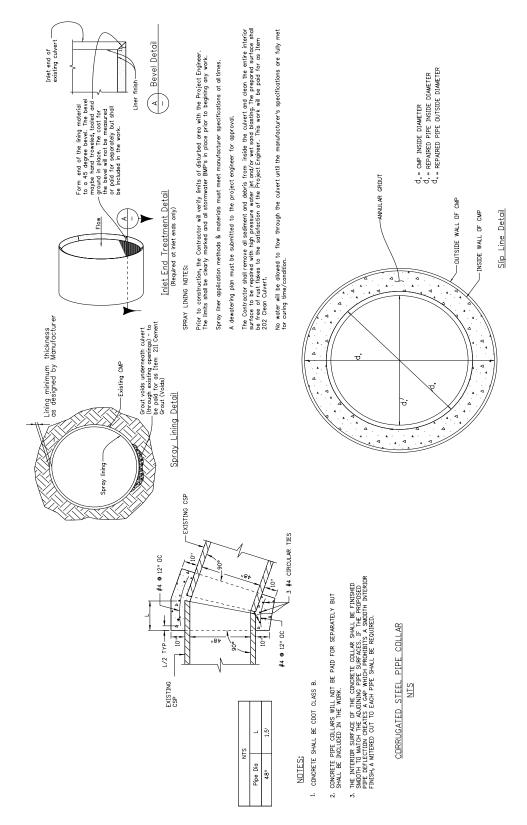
(L)-3 Sample Details for Repairing a circular culvert by slip-lining
